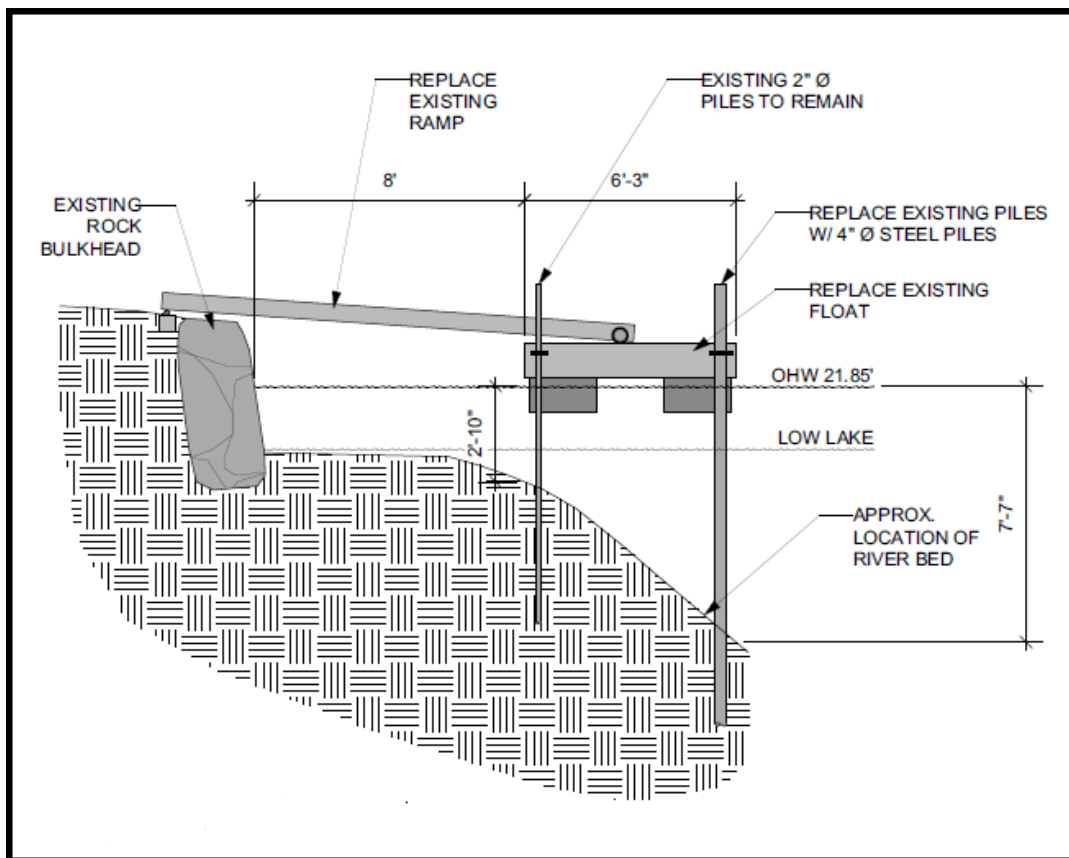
Side-profile drawing of the existing configuration of the float and ramp with depictions of proposed replacements. The existing OHWM of the Sammamish River is also depicted (Adapted from Sheet 4 of 4 in Ecco Design Inc. 2021).
